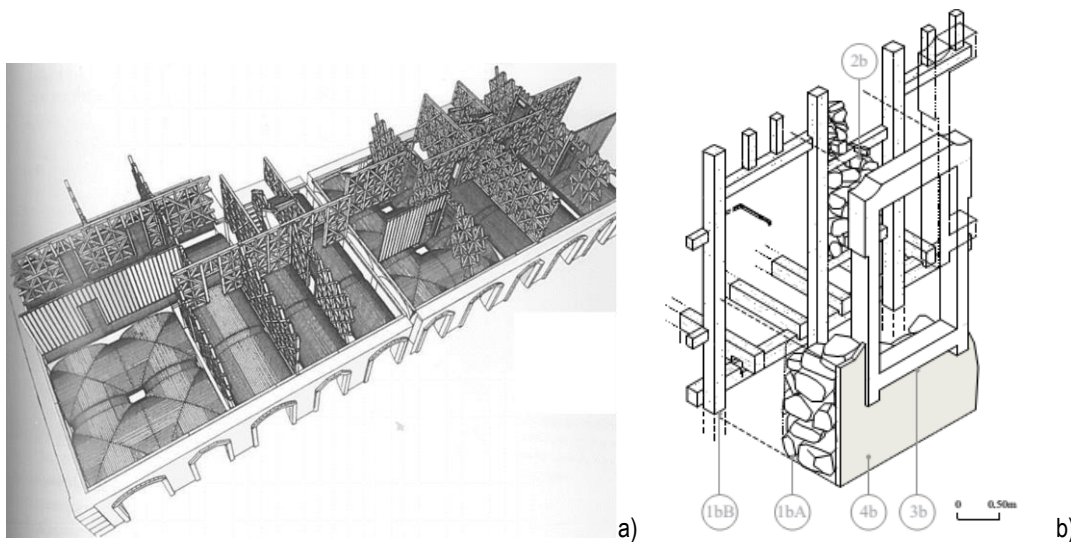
Global schematic representation of a) an original Pombalino building (adapted from C3ias da Silva, 2005) and b) detail of the faade structure and its connections with the timber floors (adapted from Stellacci *et al.* 2016).
